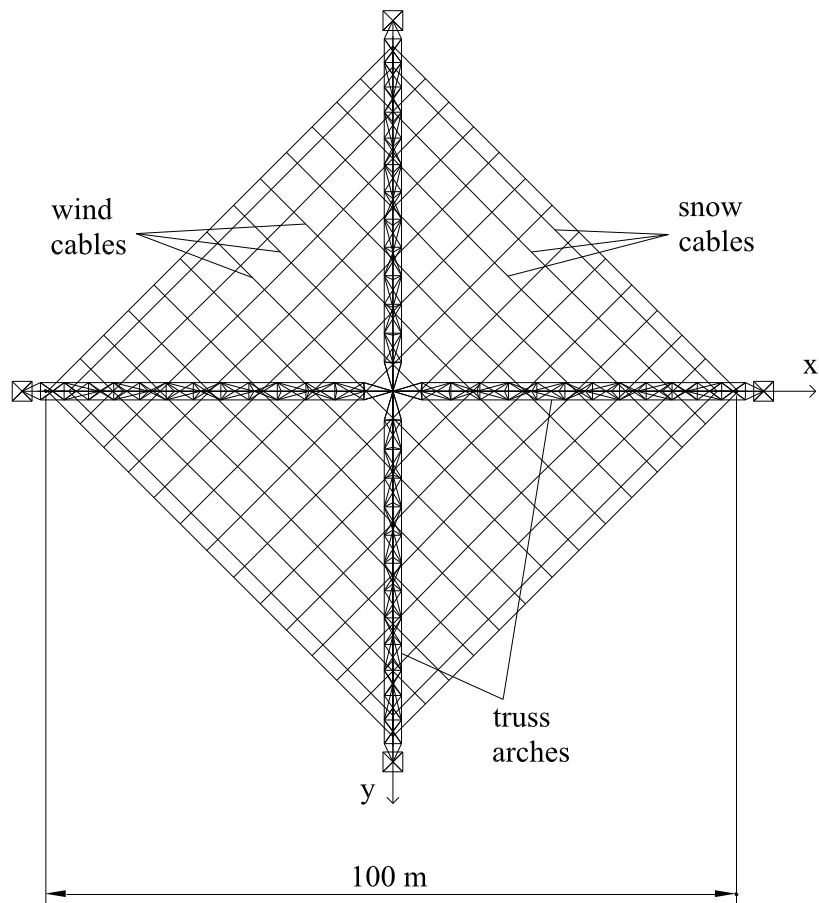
Floor plan of model 2, cable net supported by two truss arches
